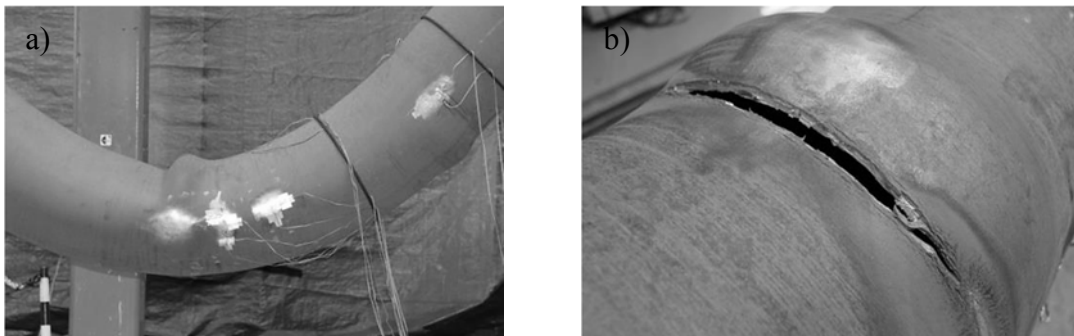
Failure aspect of SP1 specimen: a) buckle detail; b) detail of the crack at the end of the test.
